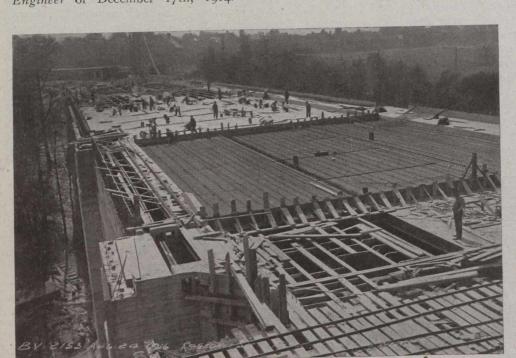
Upper Deck, Rosedale Section, Looking West.
